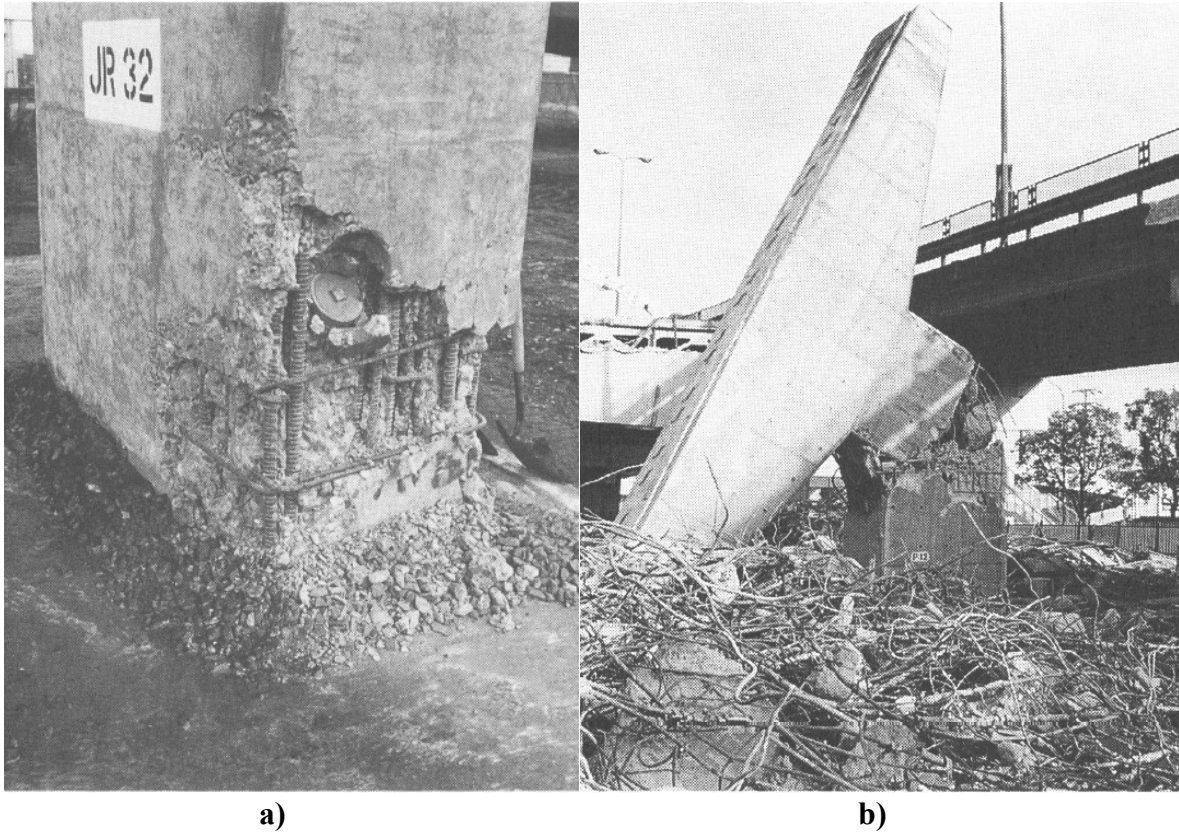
(a) Column flexural failure (Bull Creek Canyon Channel Bridge), (b) Column shear failure and collapse (I-10 Freeway at Fairfax/Washington Undercrossing), 1994 Northridge earthquake (Priestley et al. 1996)
